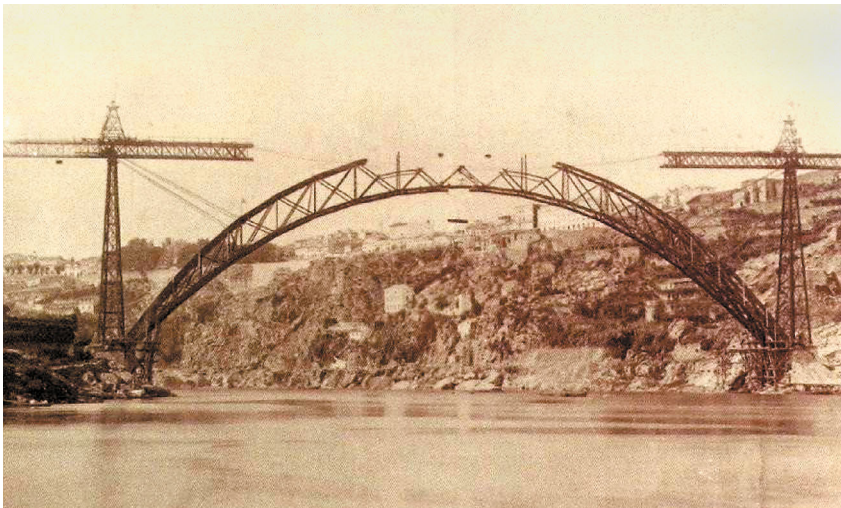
Maria Pia Bridge – Portugal, 160 m span, designed by Théophile Seyrig and built in 1877 by Gustave Eiffel.
